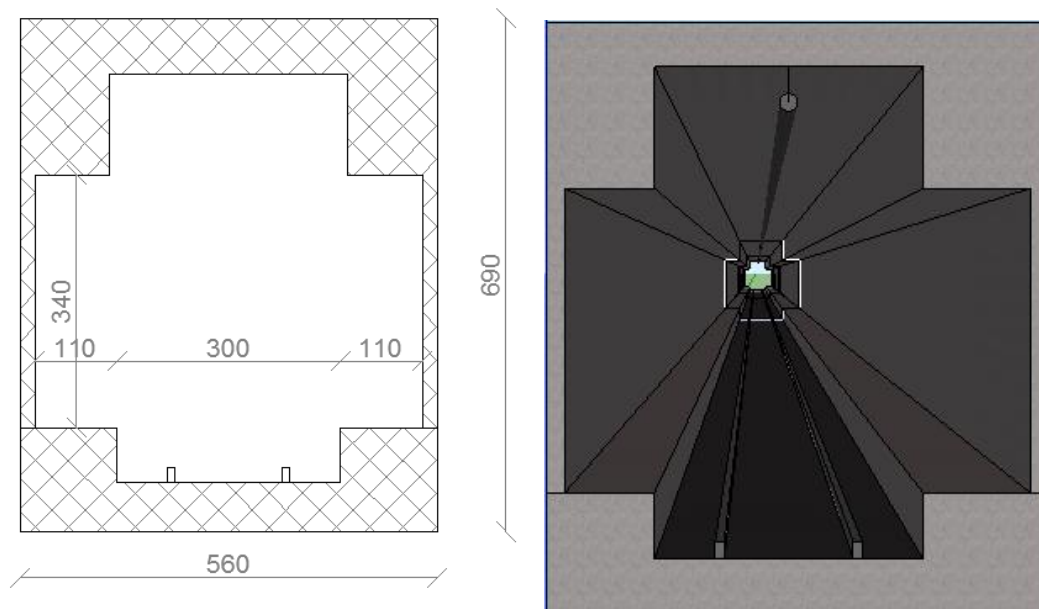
Rail Tunnel Cross Section and Rail Tunnel Rendering
